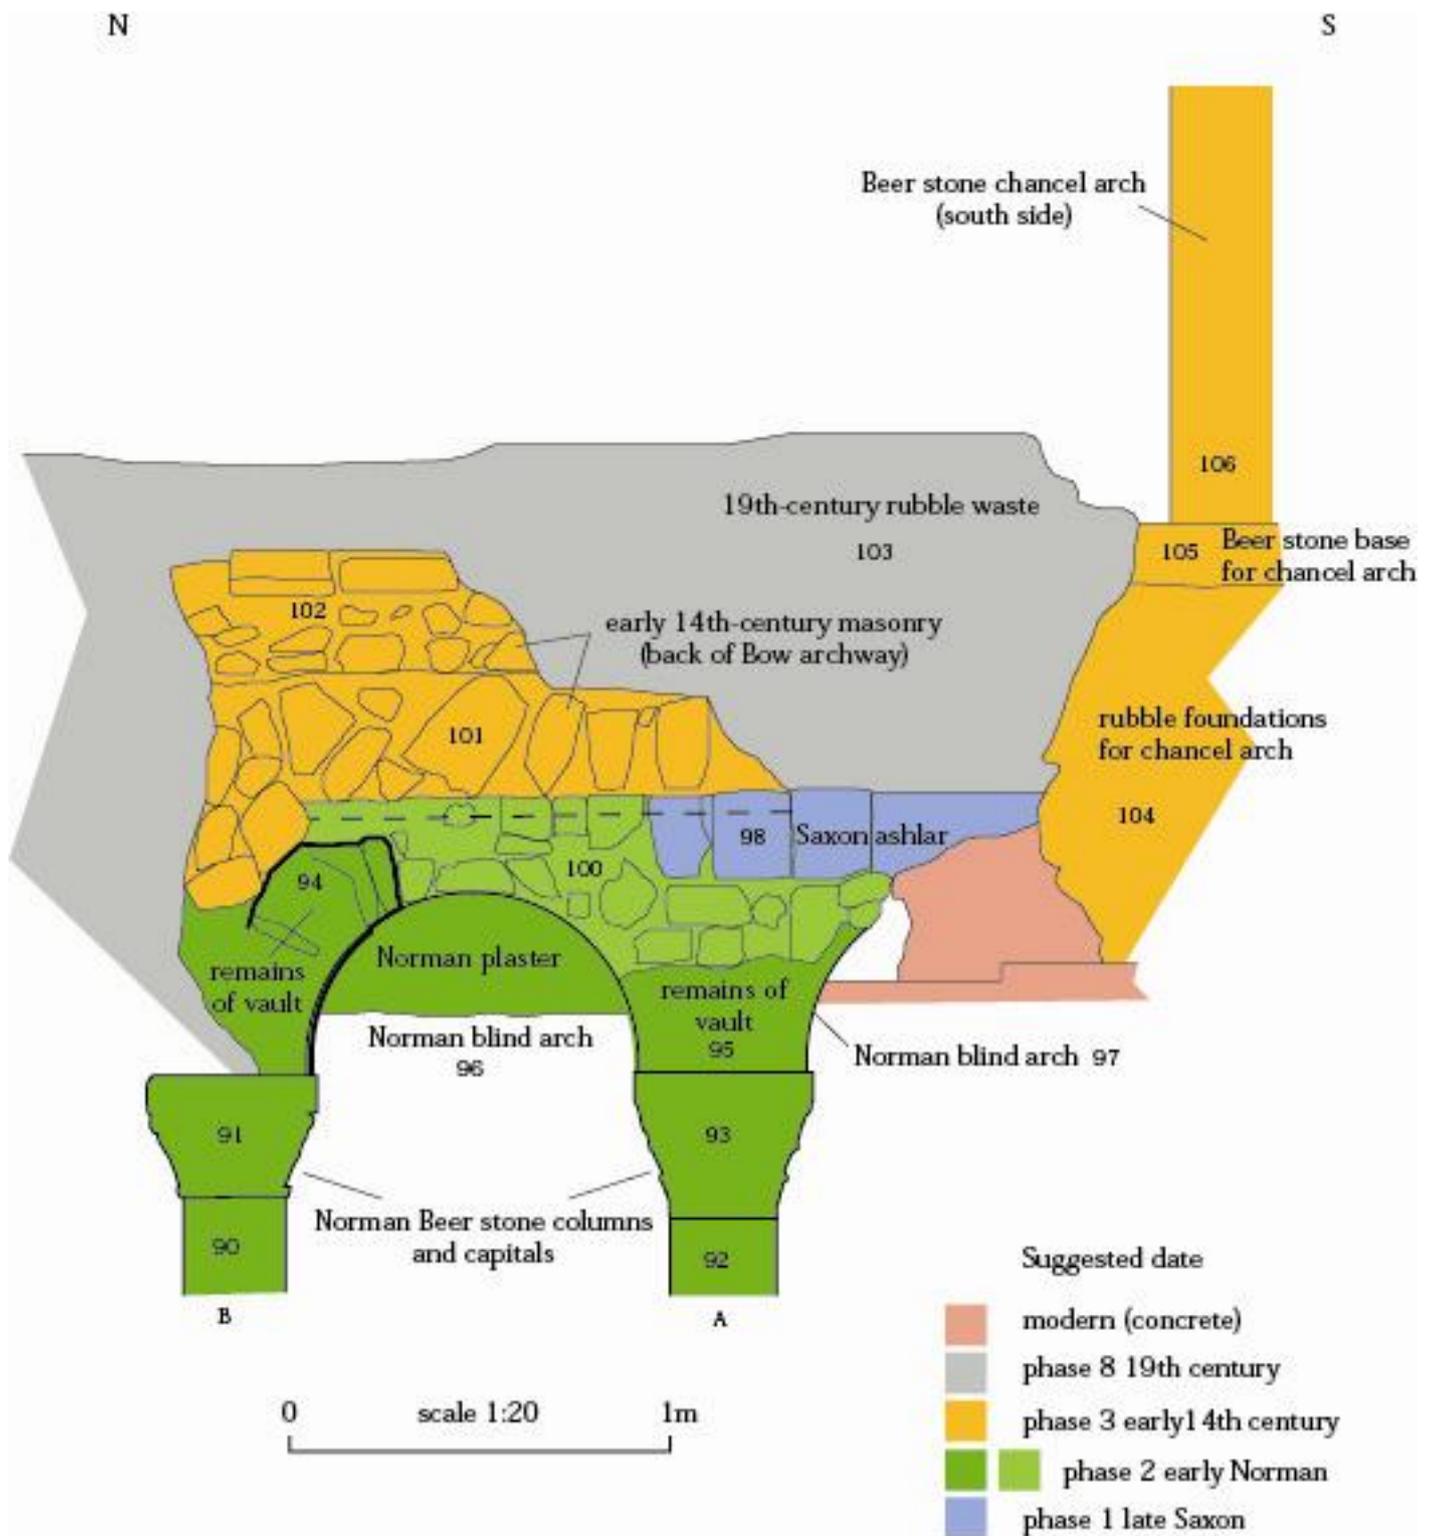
Elevation of masonry excavated beneath chancel arch, looking east.
